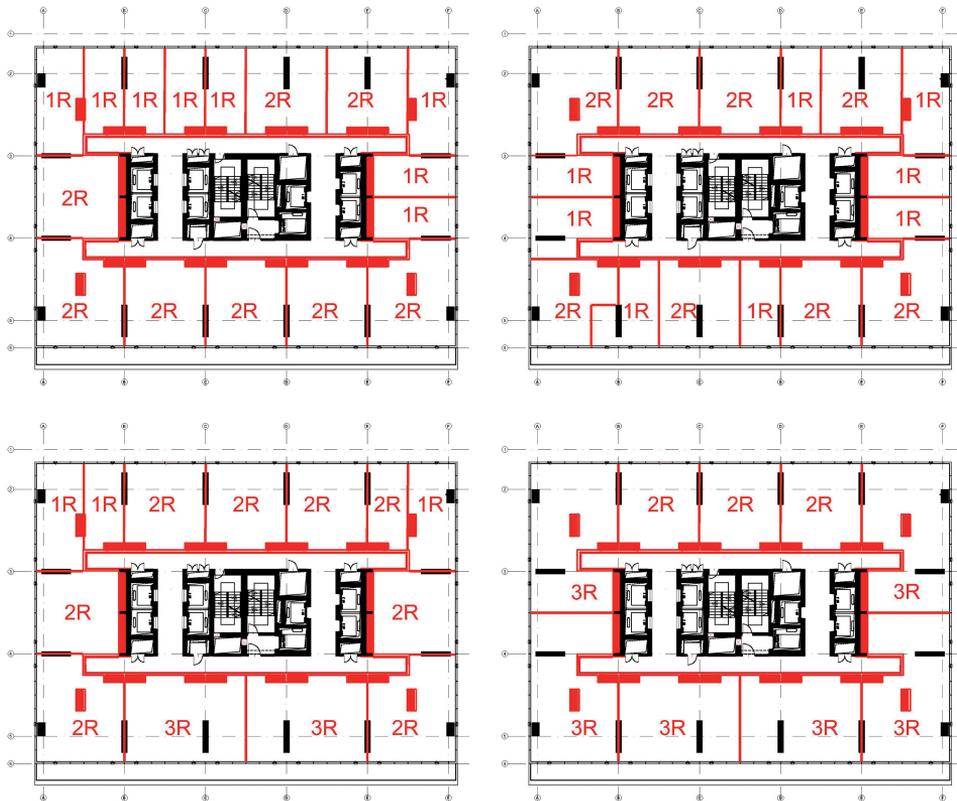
Examples of variants of the setup of types of apartments on the tower floor. Other combinations of mixing of apartment types on floors were also possible. No of rooms marked on the layout; source: Author's study
